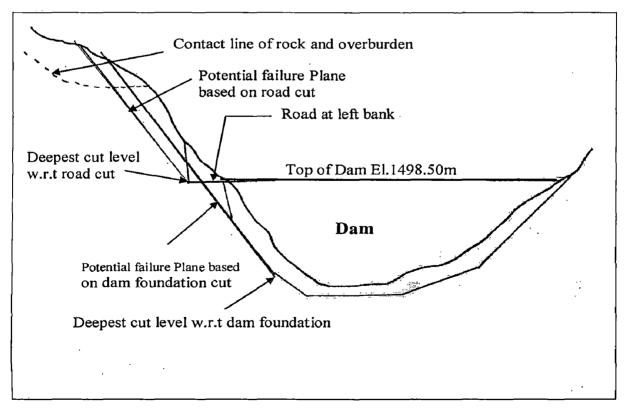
Sketch showing location of different failure planes w.r.t cuts
